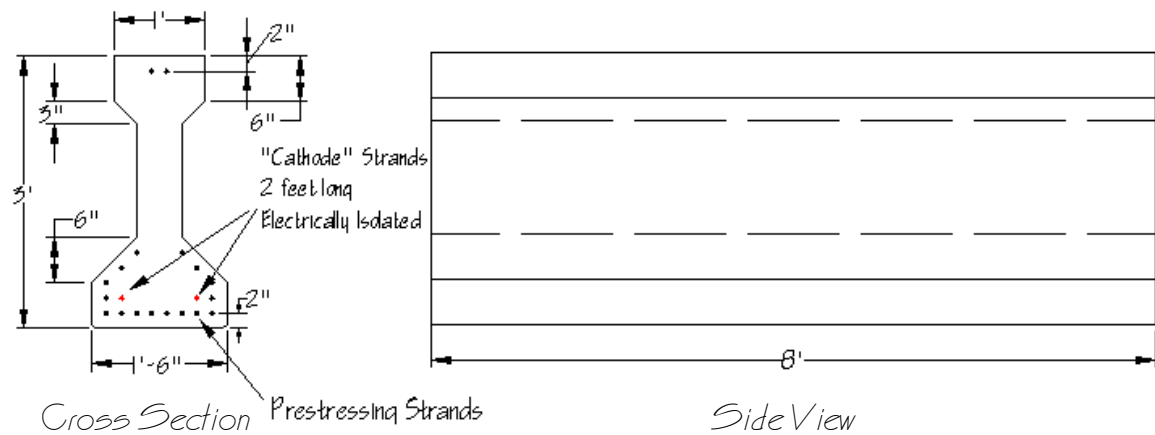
Design Details for Pretensioned Concrete Beam Specimens
